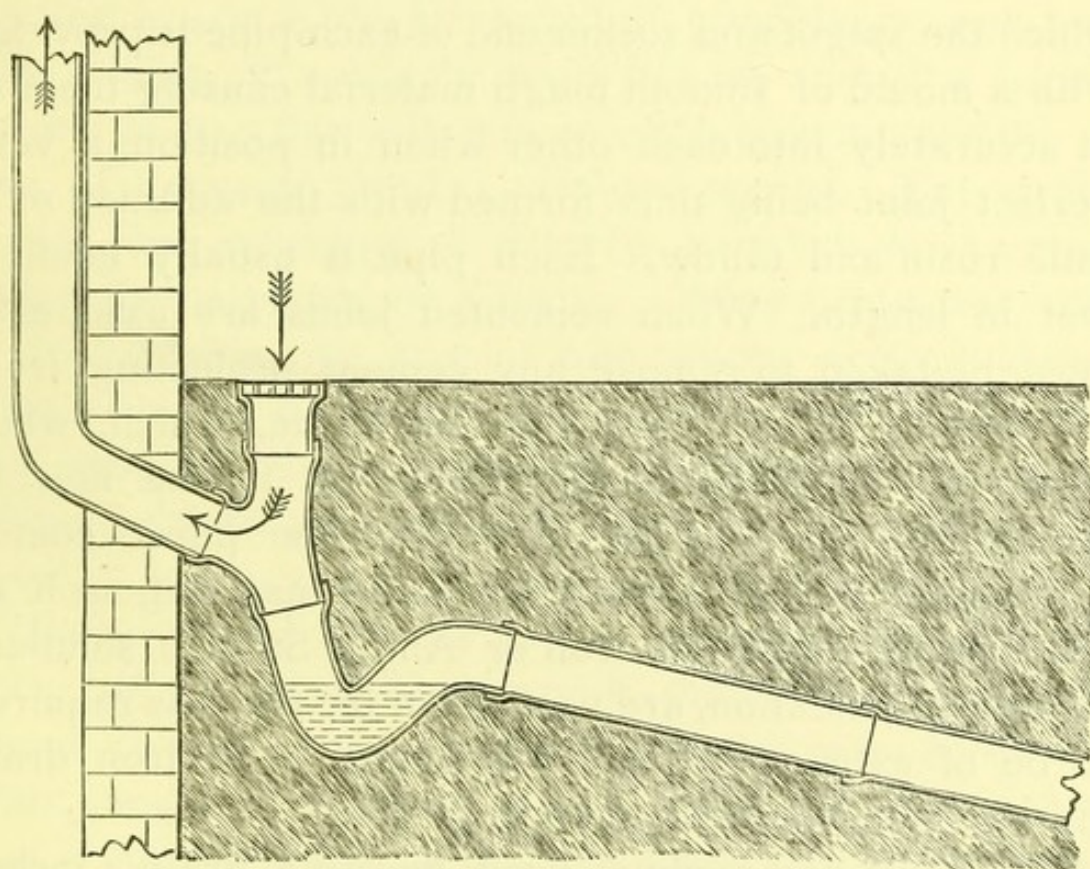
Soil-Pipe Interceptor for inside Soil-Pipe.
